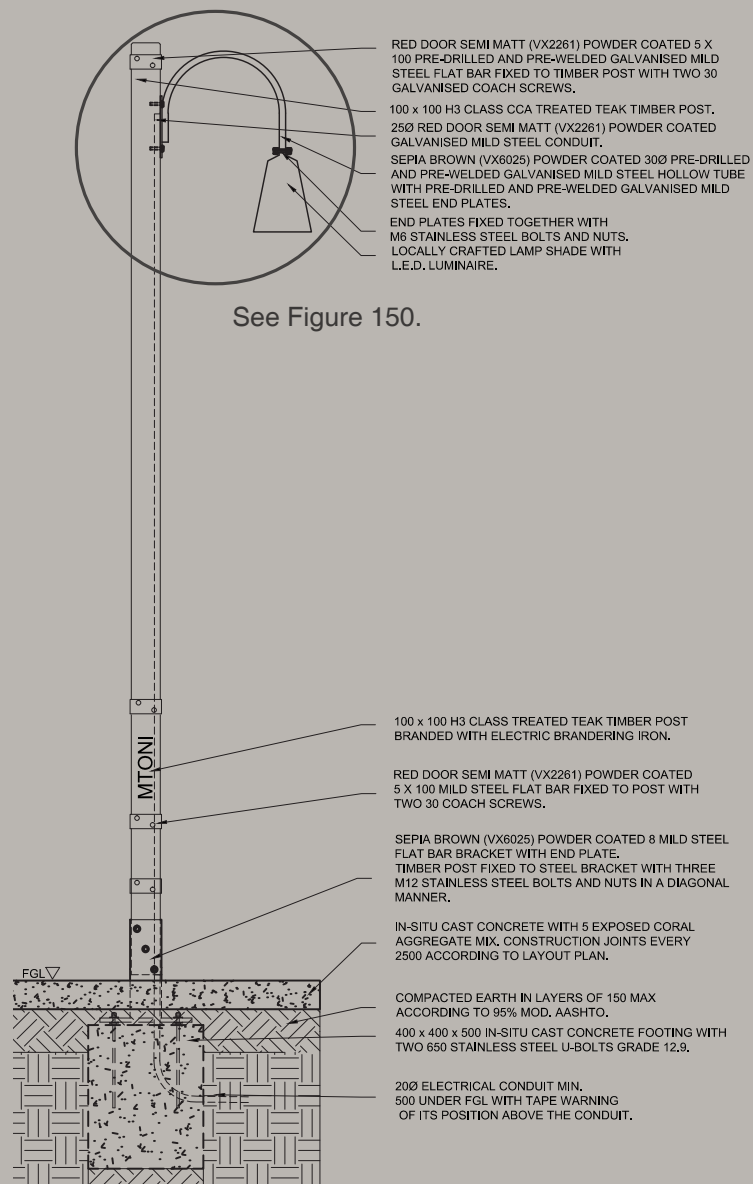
Detail Section (1:20) of Lamp Post (Author, 2014).
